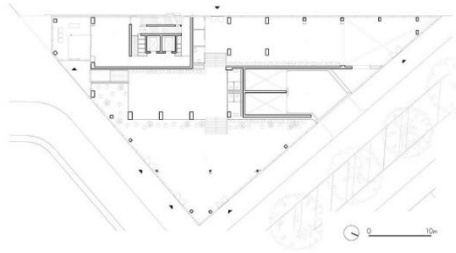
Ground Floor Plan of Haut (Url-1, 2024).
